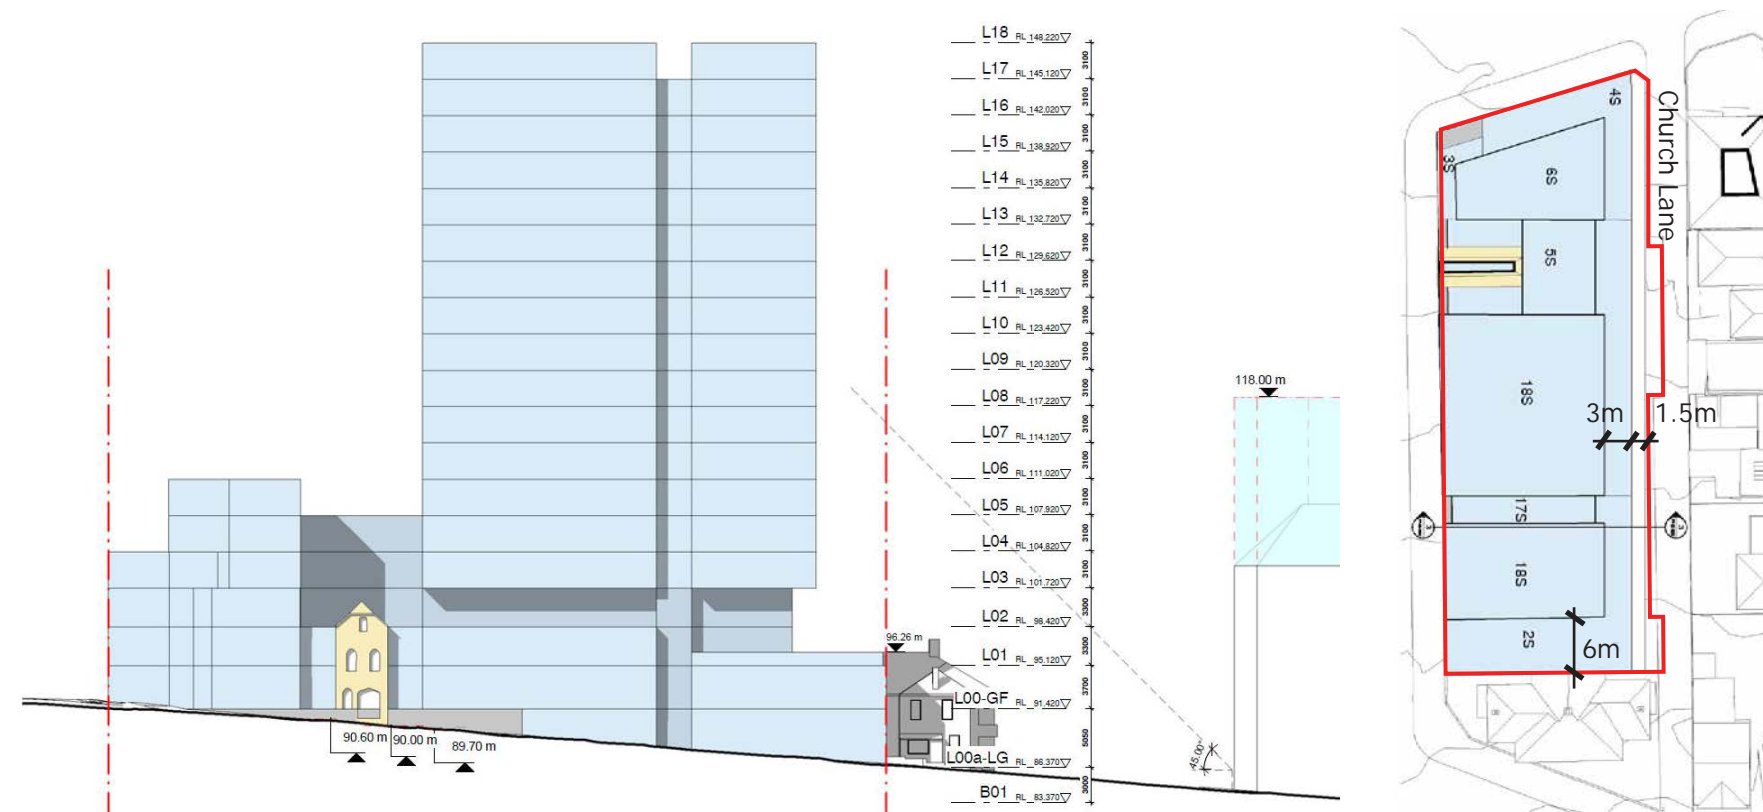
Option 2 - Elevation along Pacific Highway (left) and site plan (right) (source: PTW).
